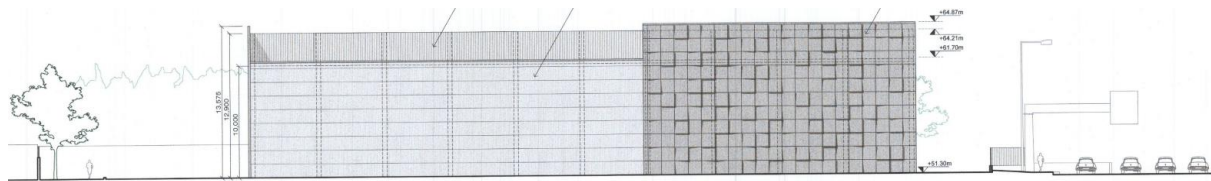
Extract of proposed east elevation of warehouse at a significant height above the adjoining road level.
